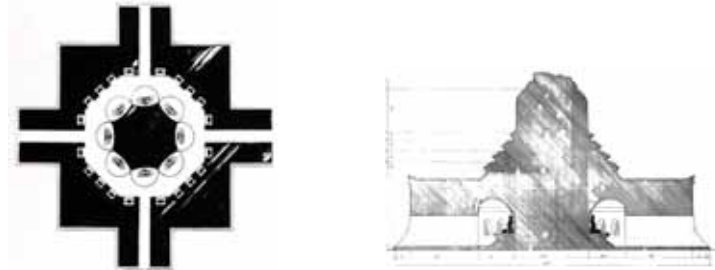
Ground floor plan and cross section of Lay-Myet-Hna temple
